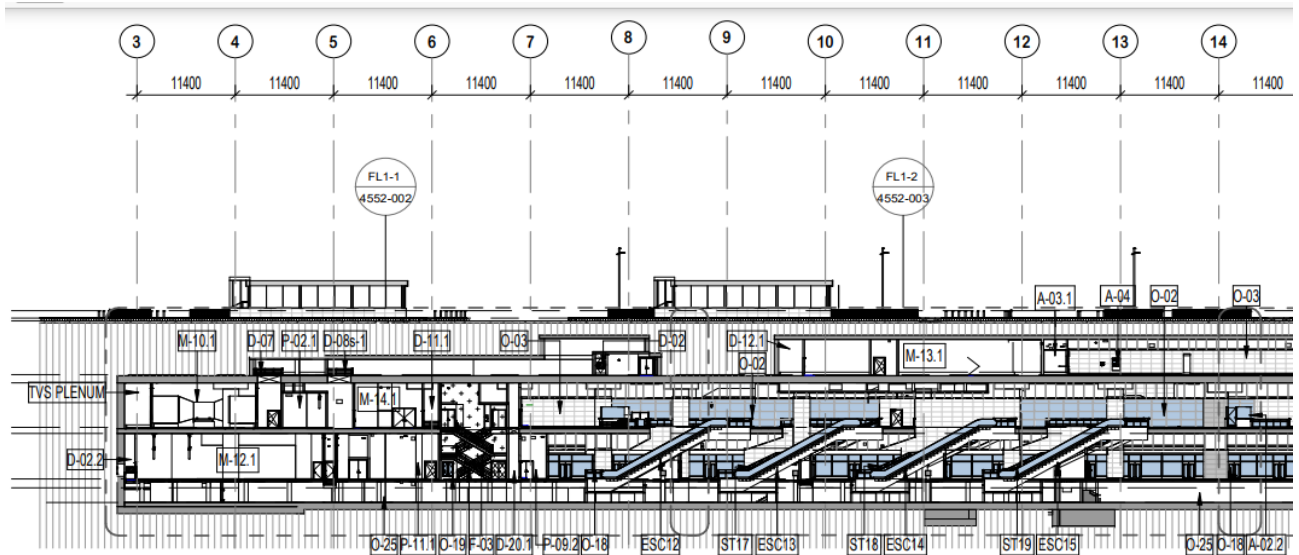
Layout(Sectional) of a typical Underground Metro Station Concourse
